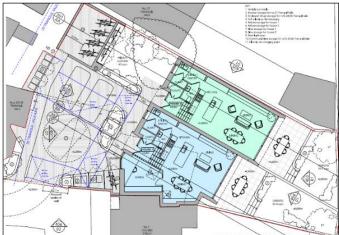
and 4 below, shows the proposed scheme and how it has developed since the last planning application.
